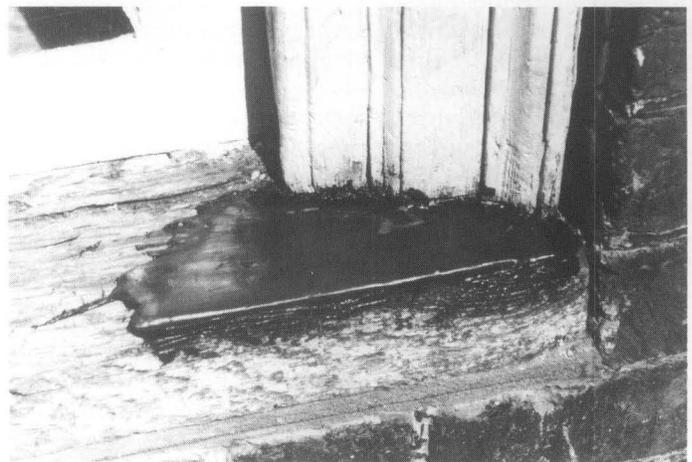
This illustrates a two-part epoxy patching compound used to fill the surface of a weathered sill and rebuild the missing edge. When the epoxy cures, it can be sanded smooth and painted to achieve a durable and waterproof repair. Photo: John H. Myers
